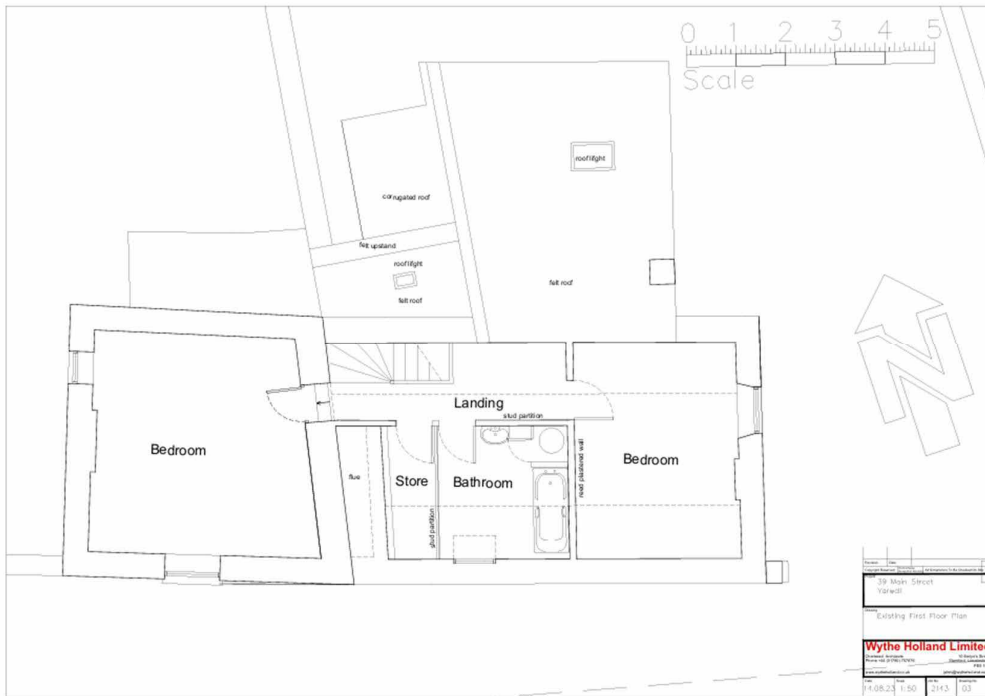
Existing first-floor plan (Wythe Holland Ltd)
